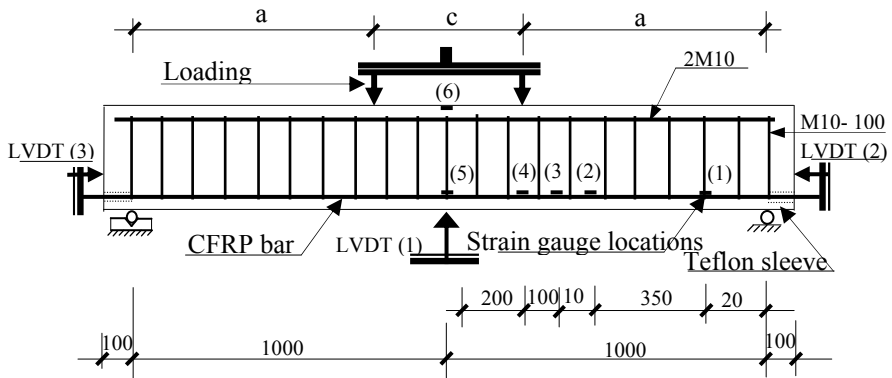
Typical beam geometry, instrumentation, and testing arrangements.
